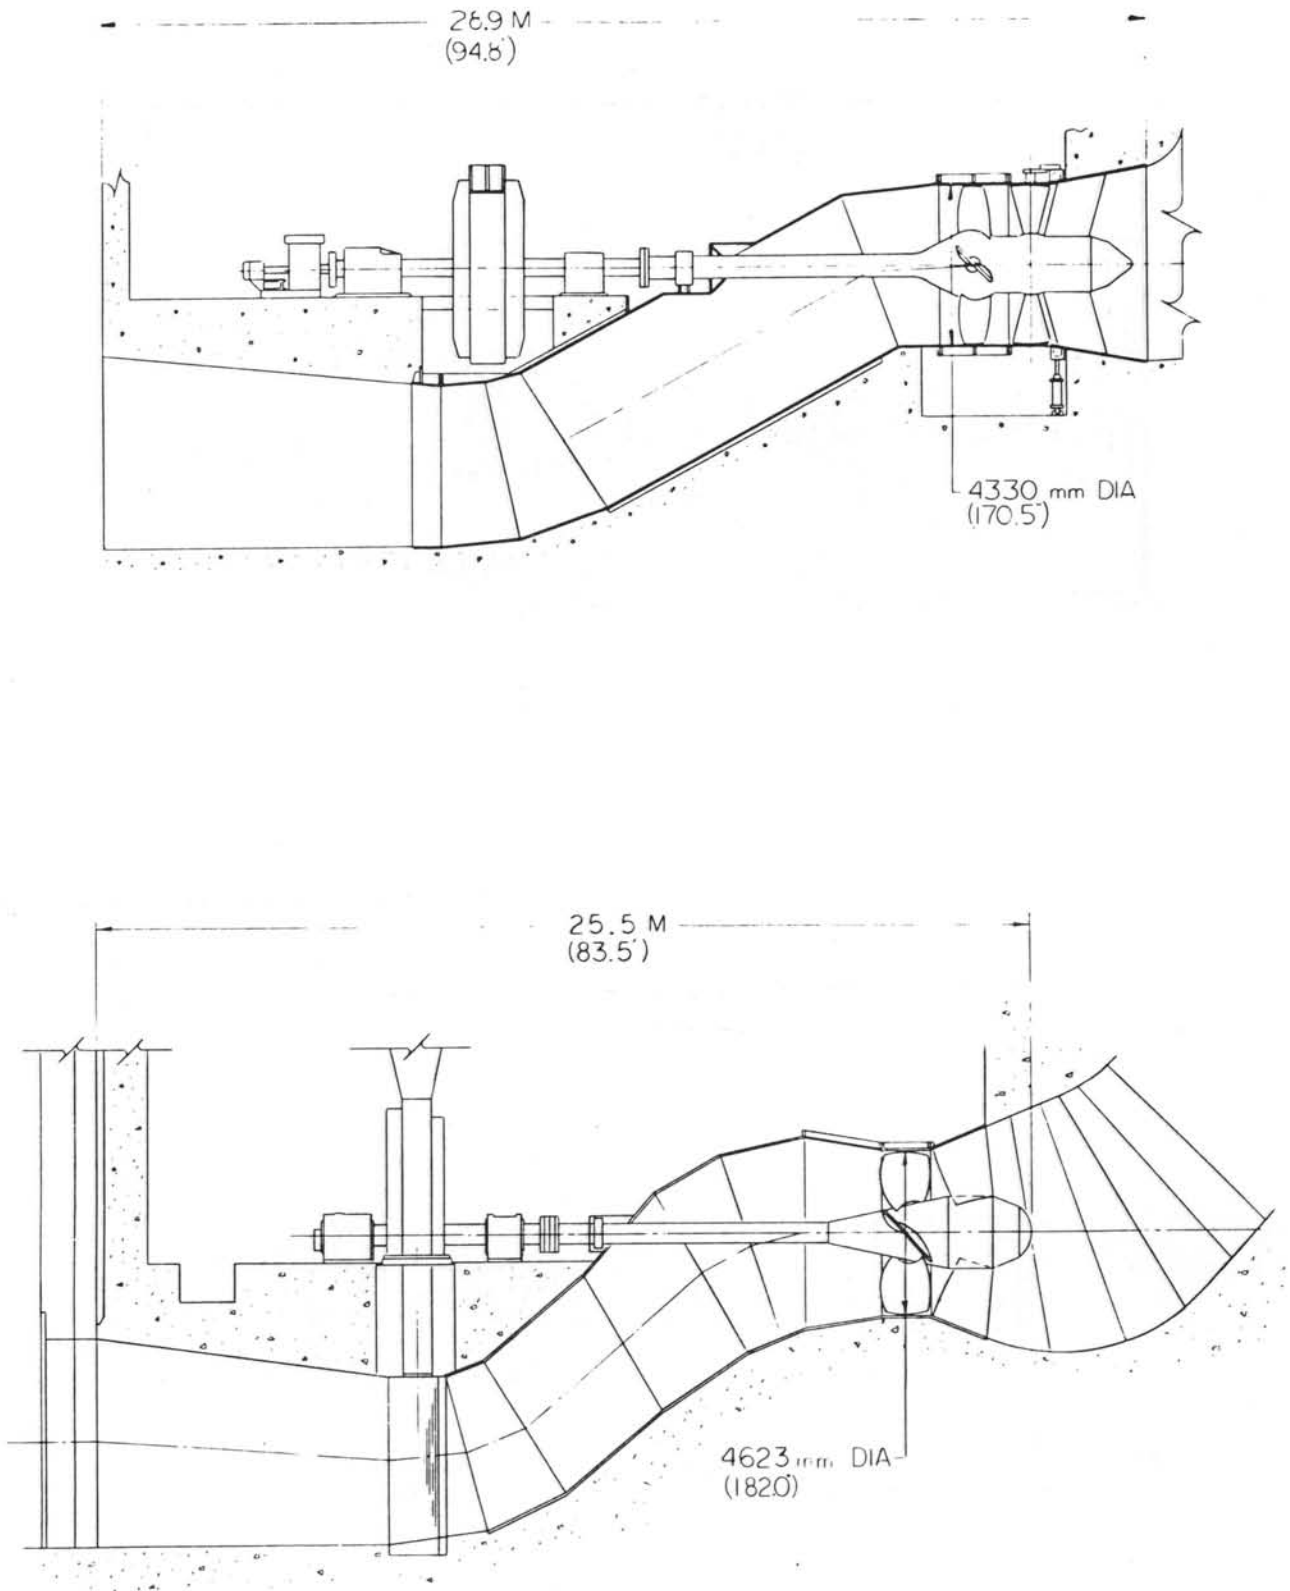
(Top) Tube turbine installation, Chaudiere II Project, Quebec, 1968. 1-10,000 kw, 11m. (36') head. (Bottom) Tube turbine installation, Cornell Project, Wisc., 1976. 3-10,000 kw, 11m. (36') head.
